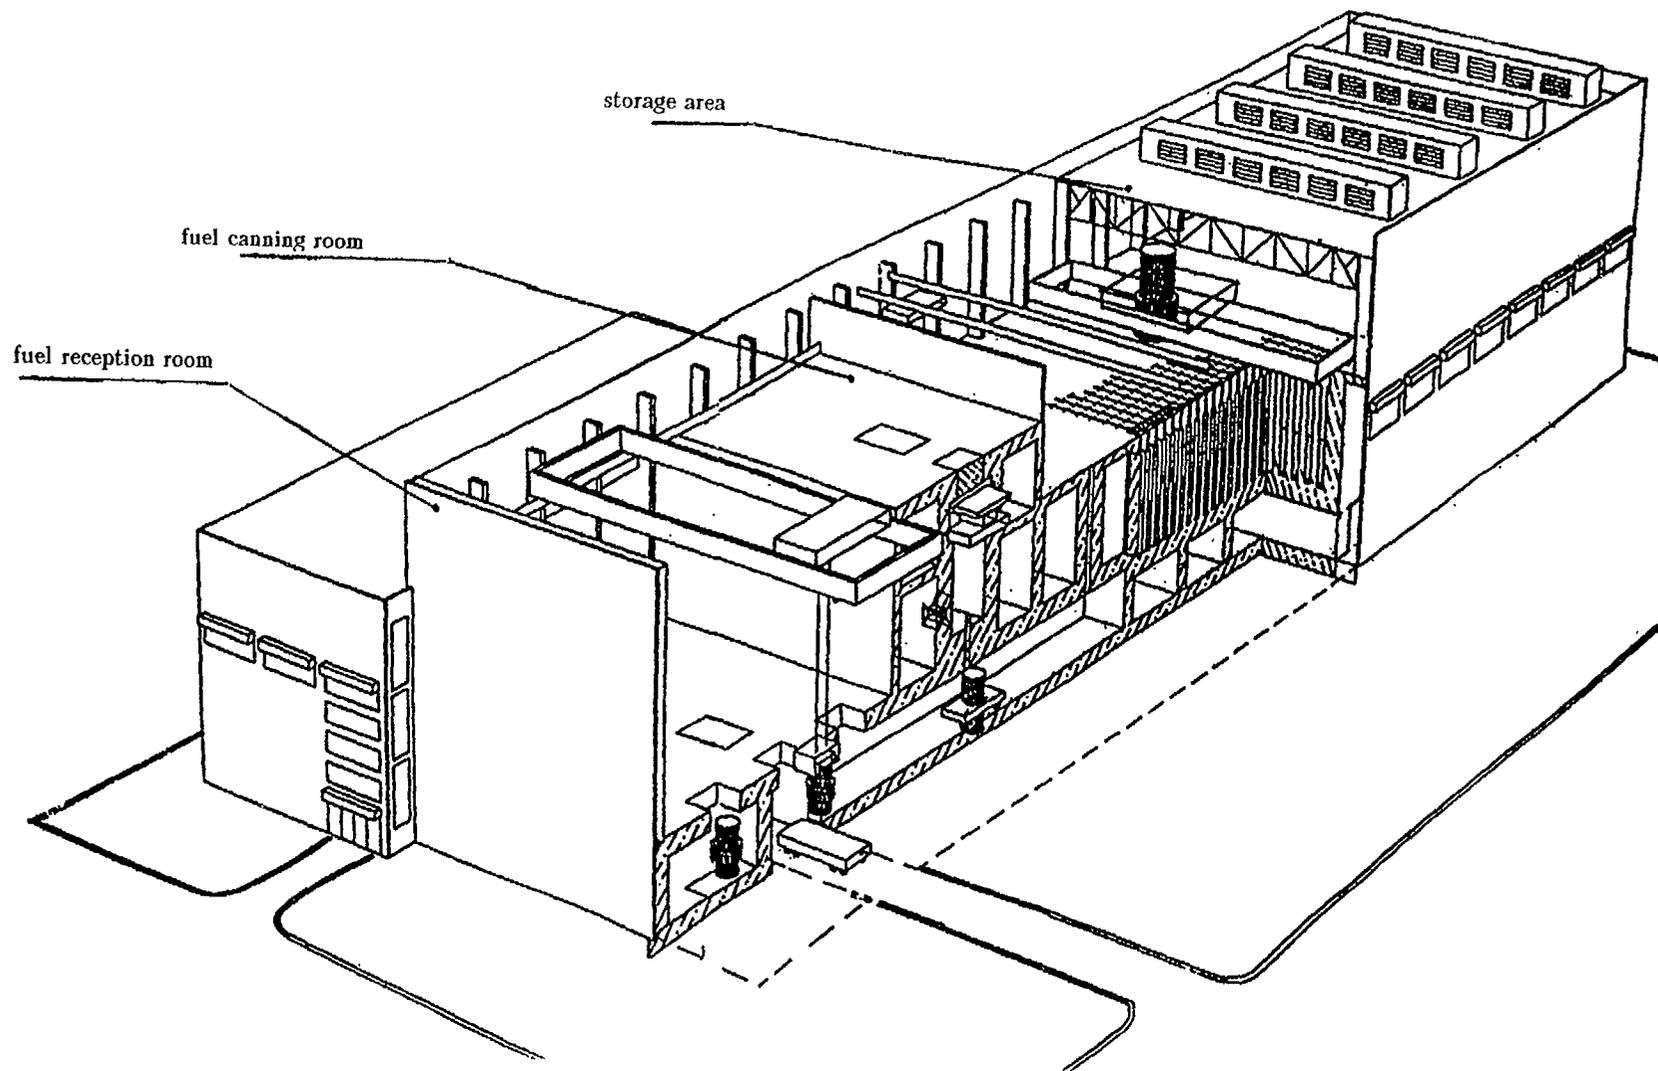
Long term dry storage facility in ferroconcrete block.
